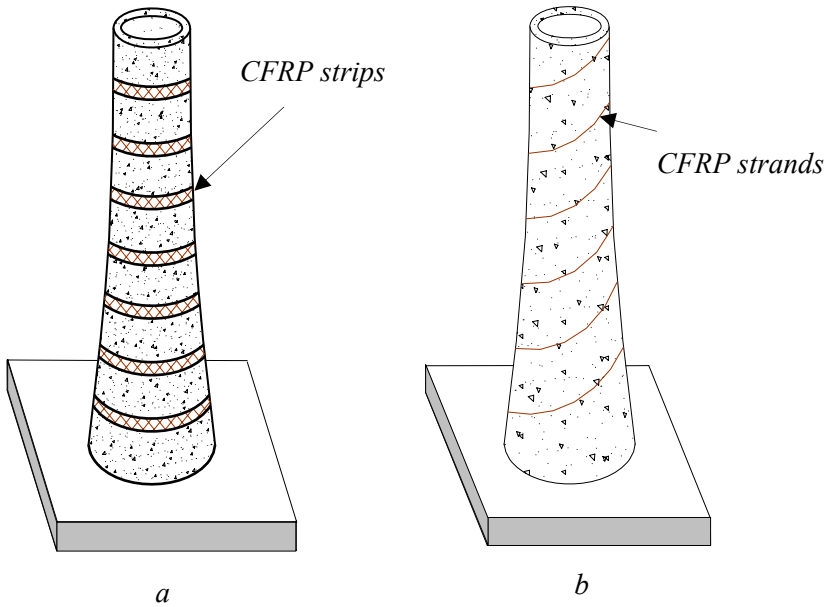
Concrete chimneys' strengthening: a) FRP strips; b) FRP strands
